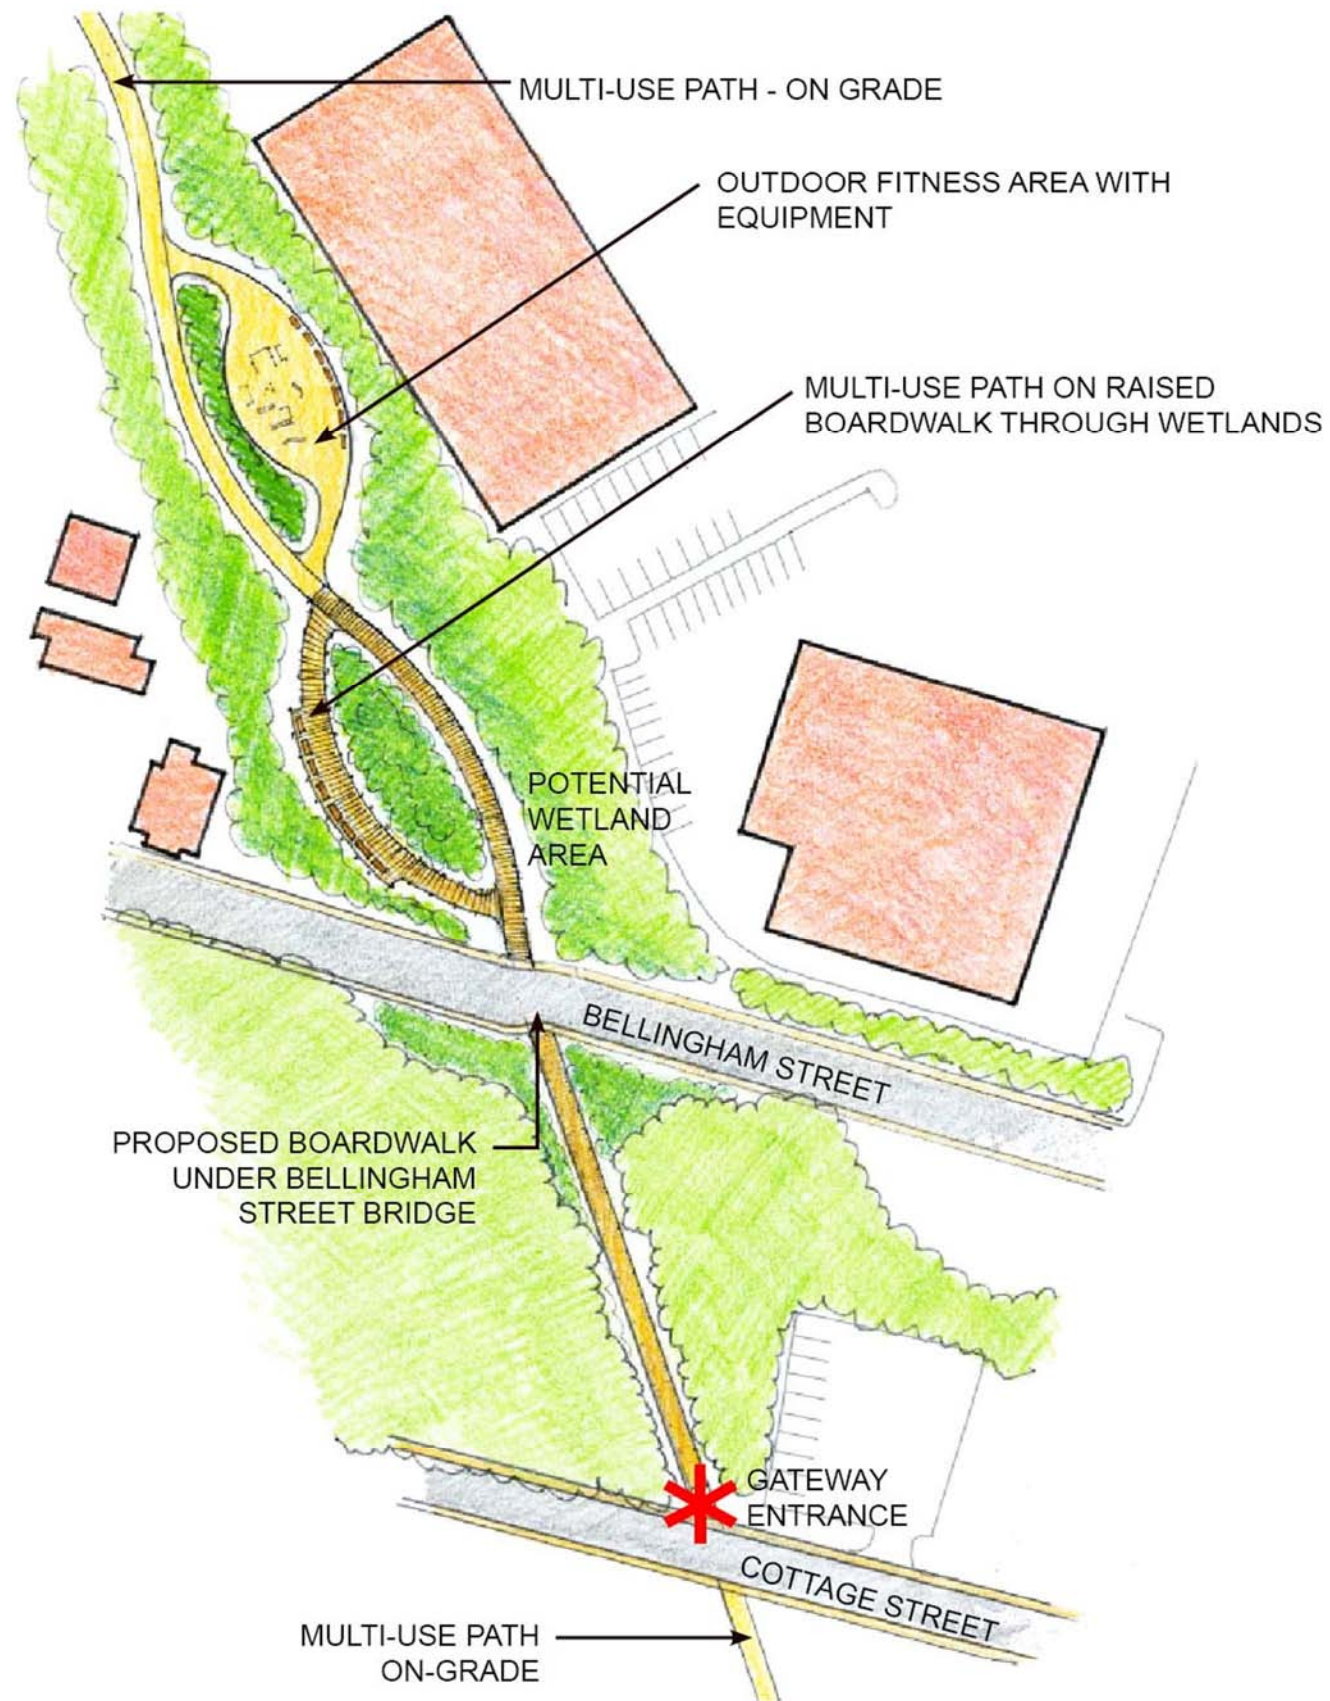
Segment 1 - Plan View of Fitness Area and Boardwalk
